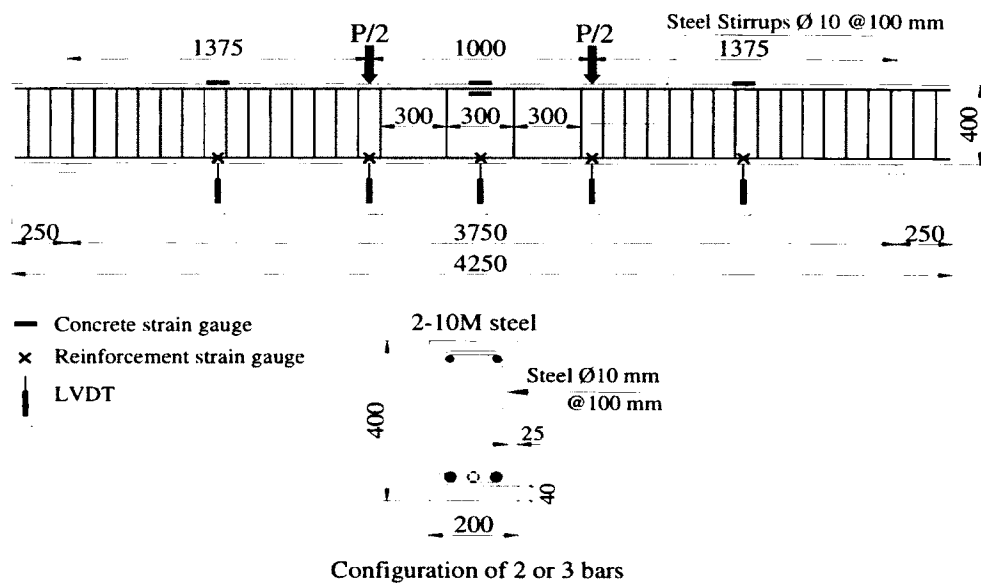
Dimensions, reinforcement details, and instrumentation
